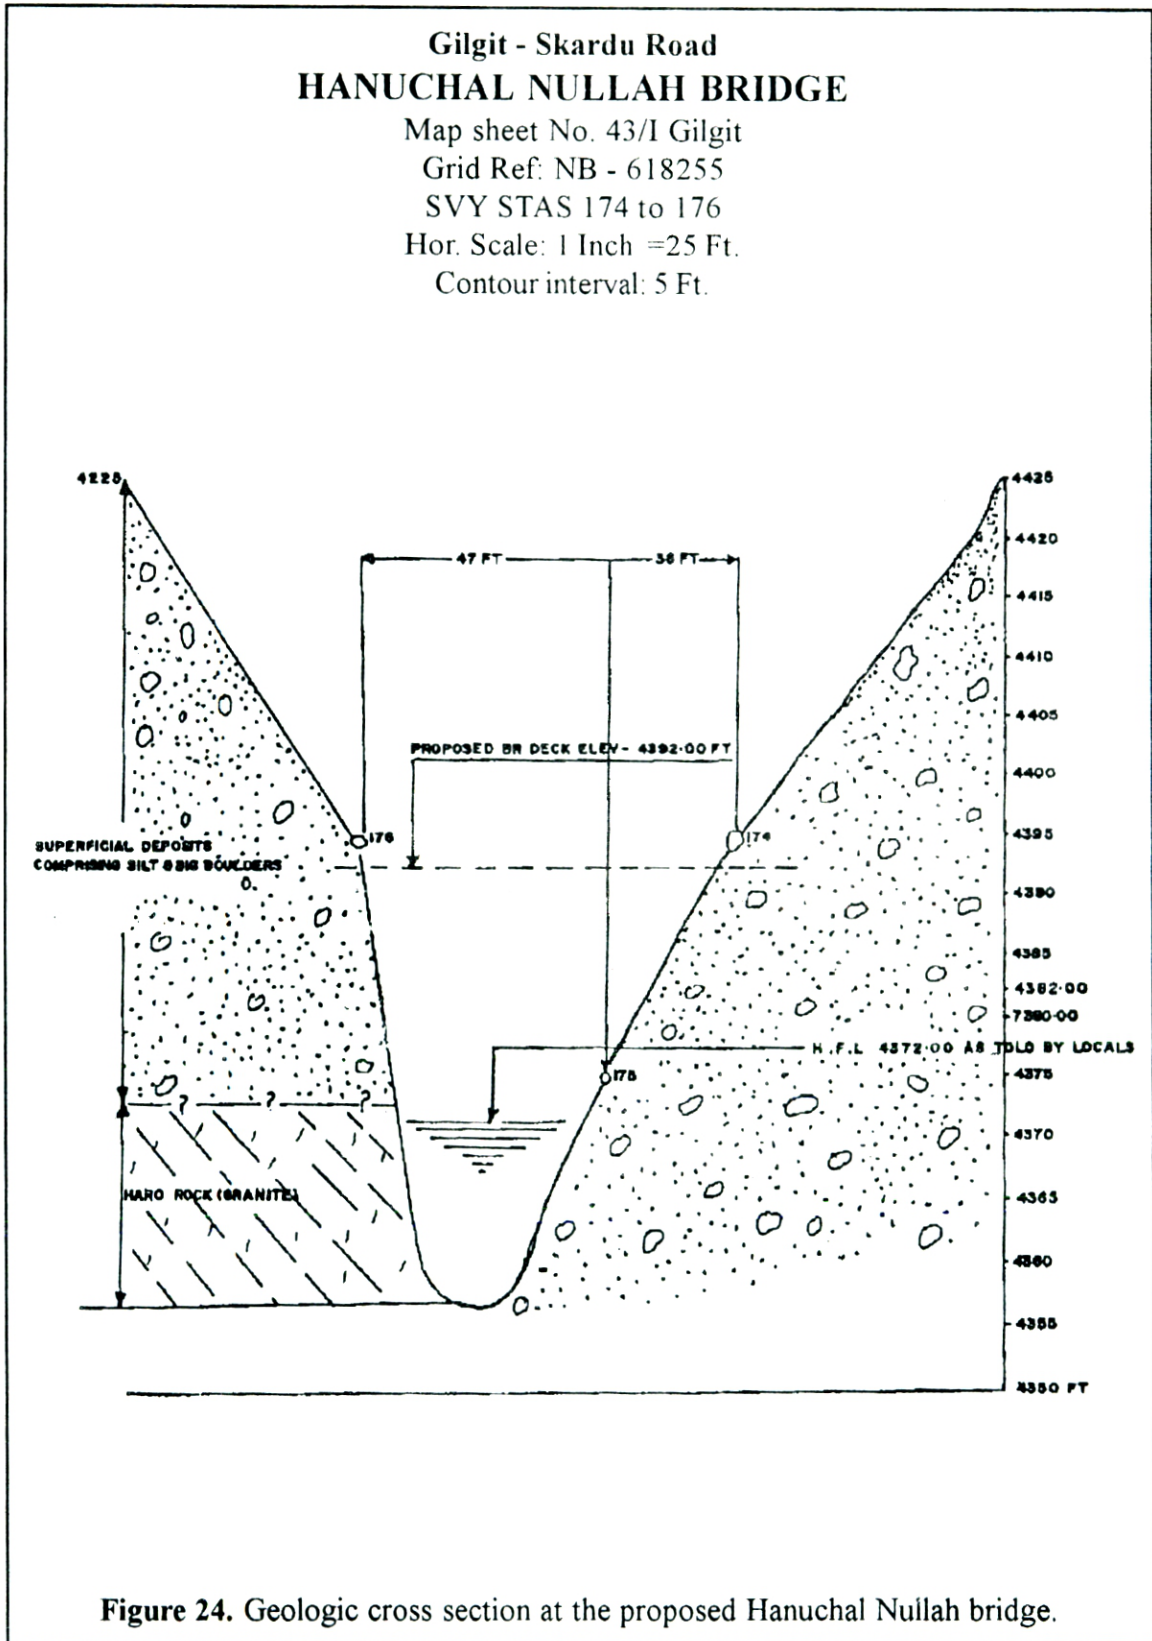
Geologic cross section at the proposed Hanuchal Nullah bridge.
